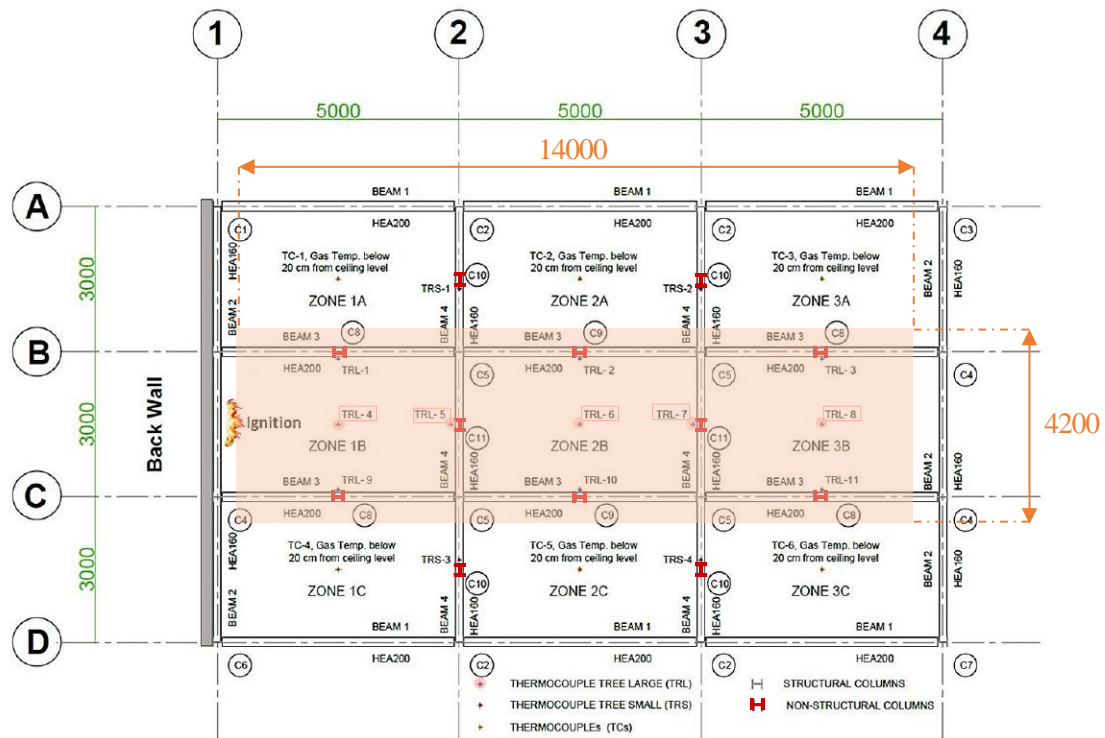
Layout plan of the structure and location of the fuel load (dimensions given in mm)
